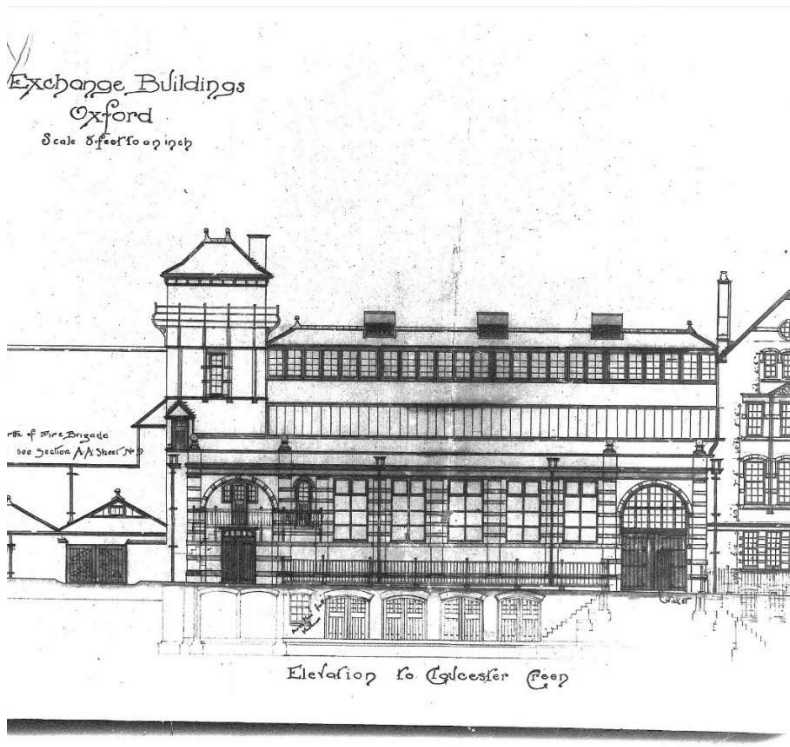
"Corn Exchange Buildings", Elevation to Gloucester Green, 1894.
